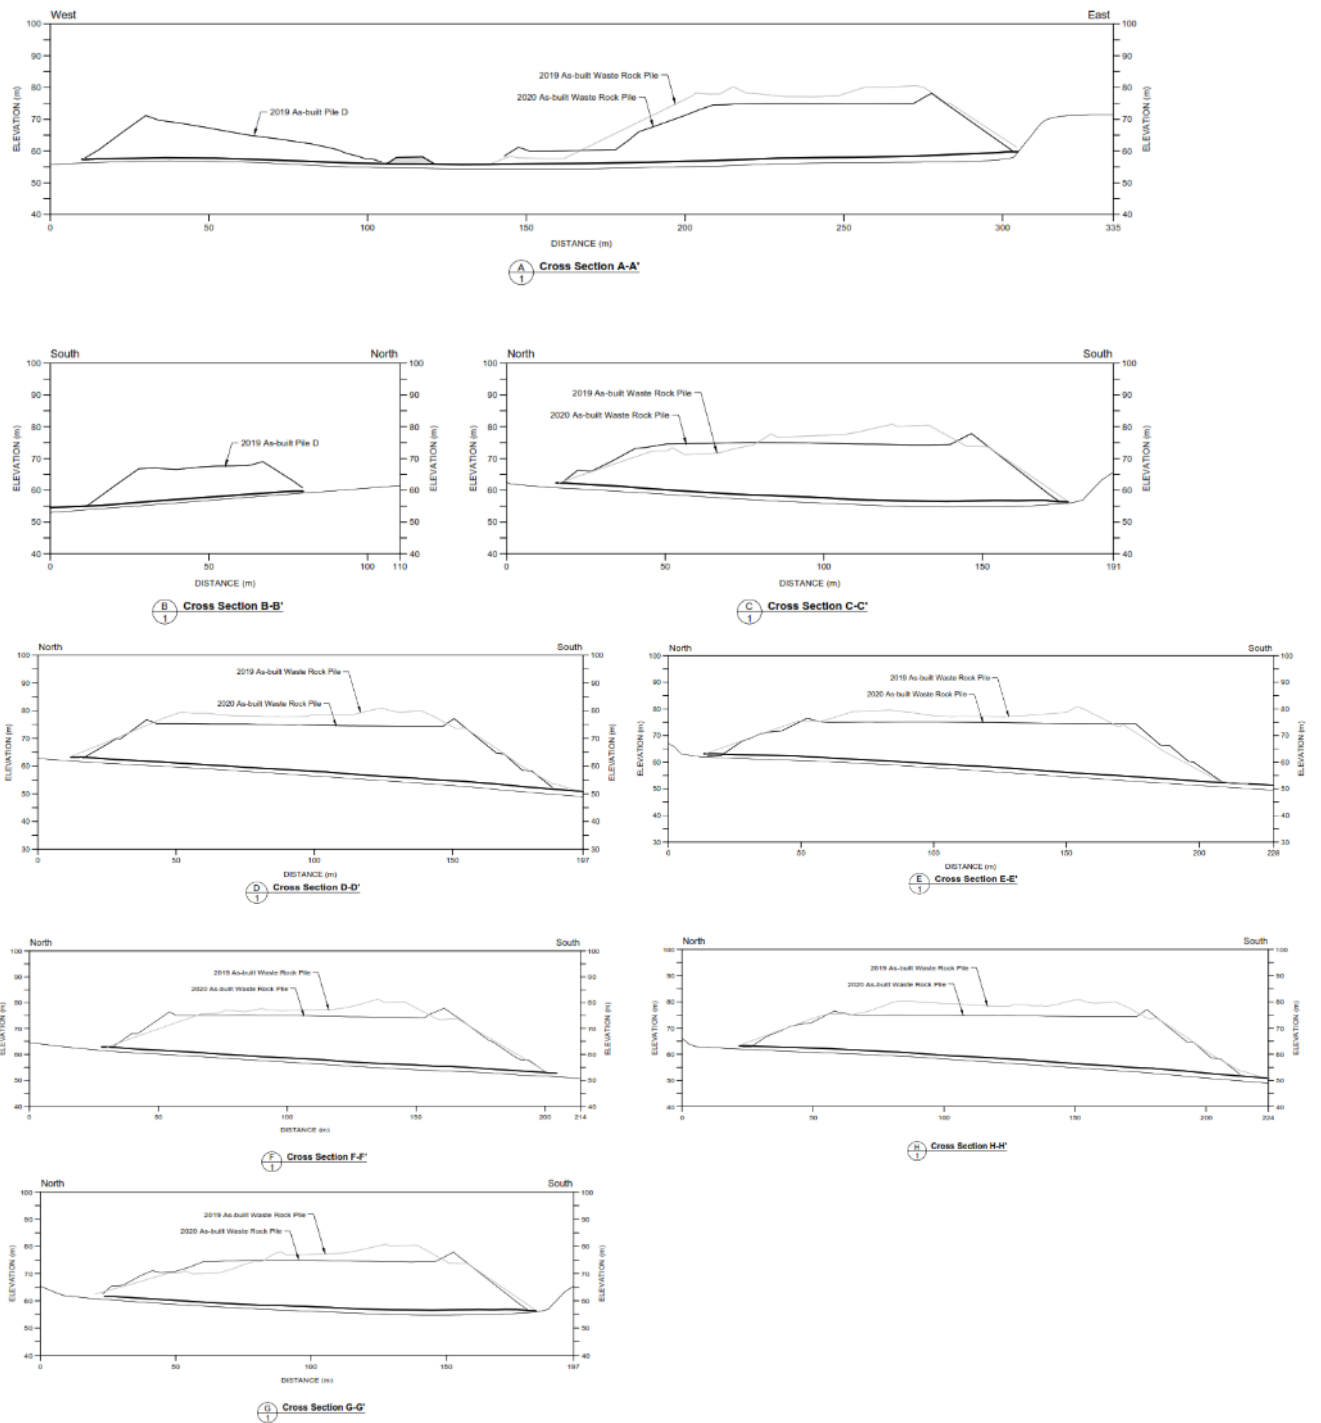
Pad-T As-Built Waste Rock Pile Cross Sections
